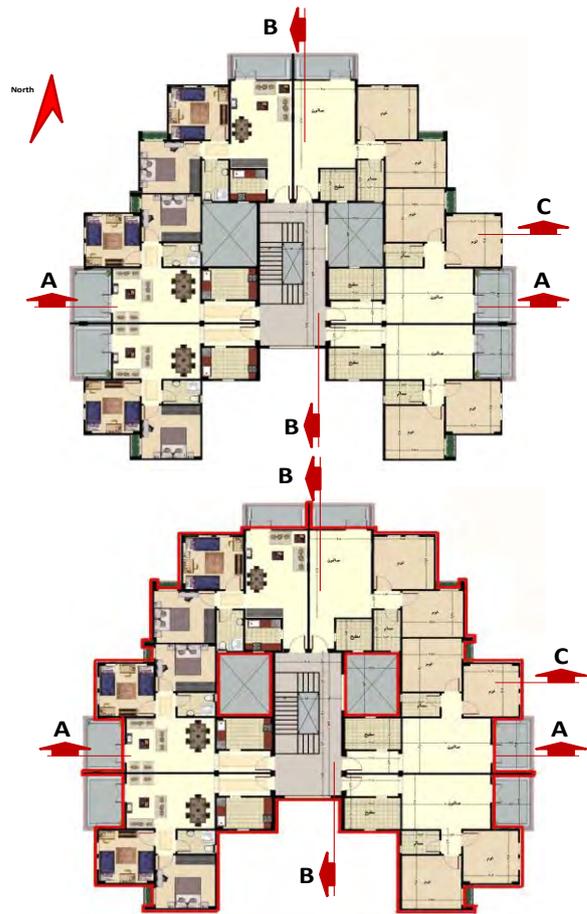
Case study floor plan before (above) and after adding insulation around external walls (below)
